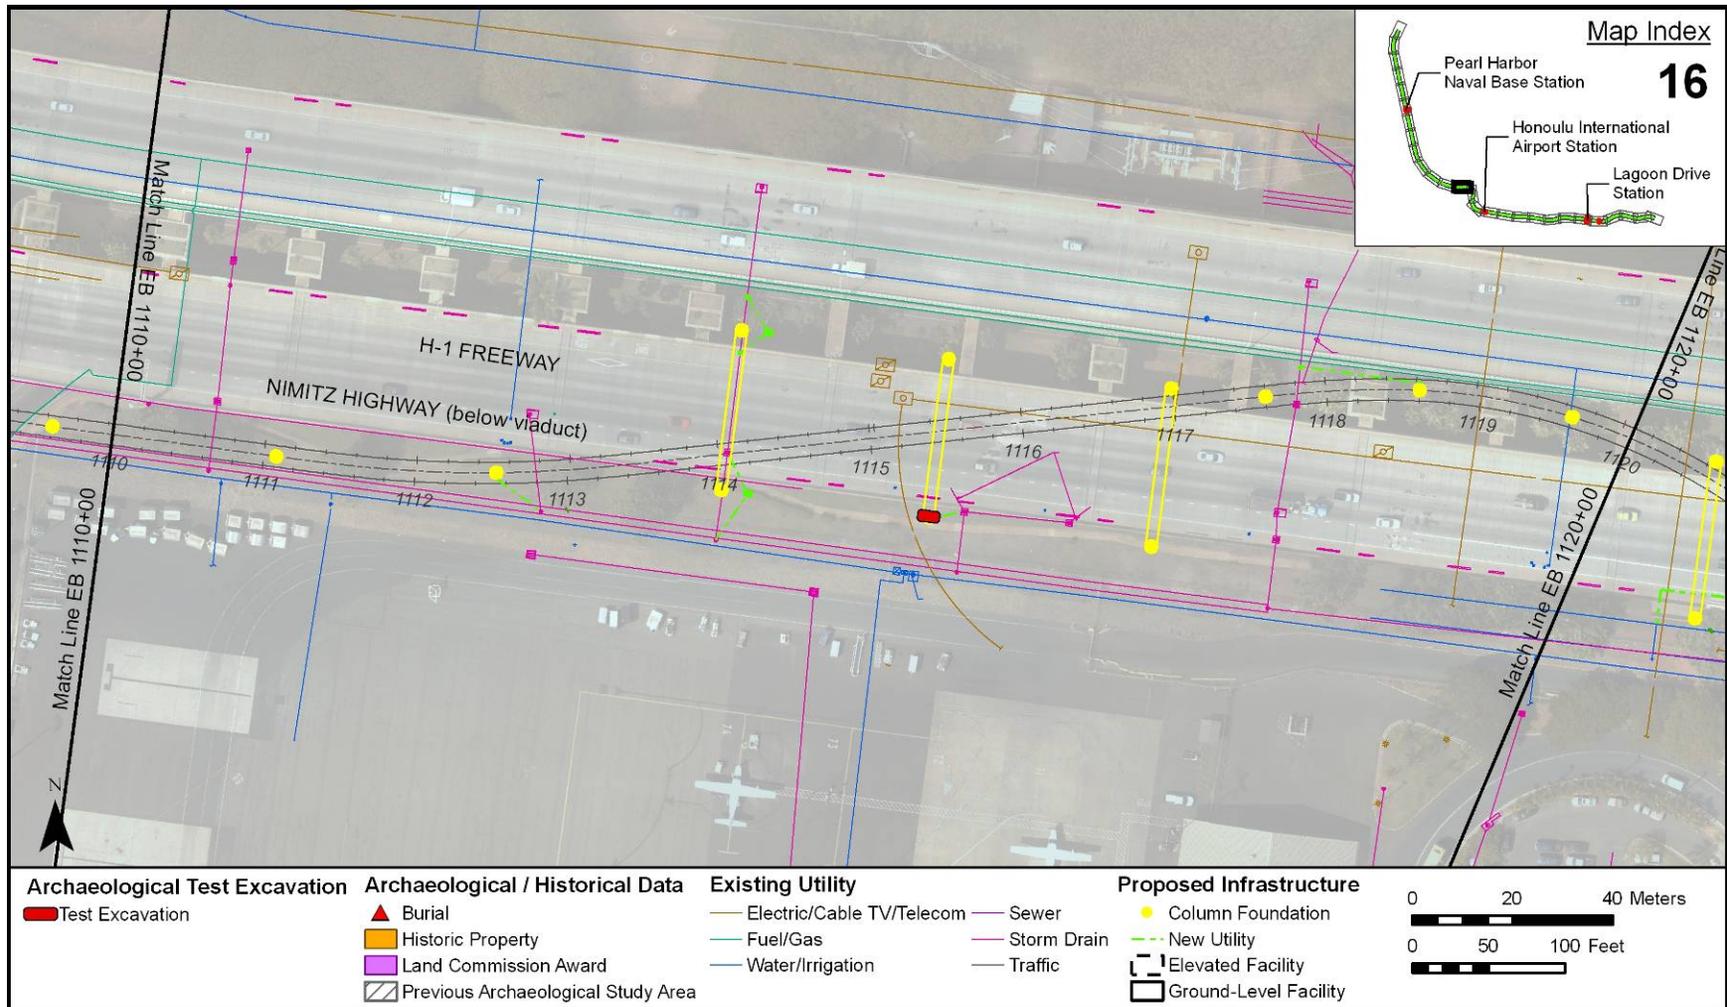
Map Sheet J 16, one 10x3 excavation at (*makai*) column foundation @ 1115+30
